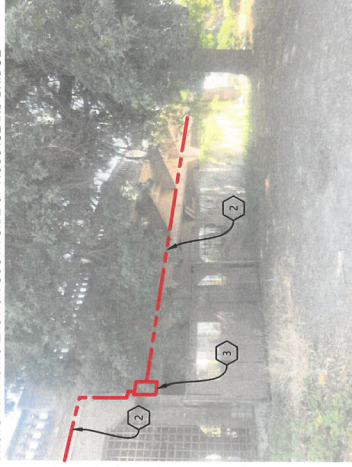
FACING WEST ON SOUTH SIDE OF BRIDGE EAST SIDE OF WILLAMETTE RIVER
